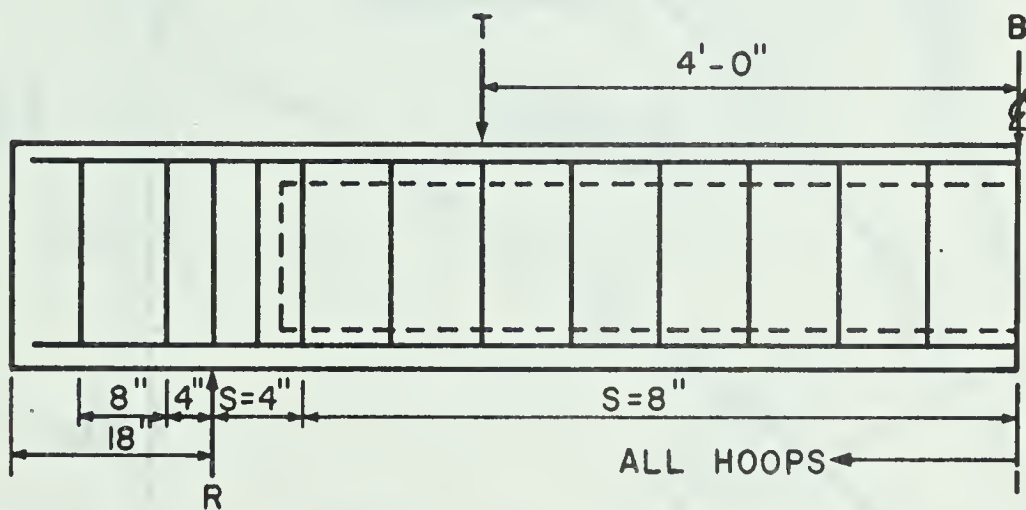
(B) REINFORCEMENT FOR BEAMS R3, R4, R5
